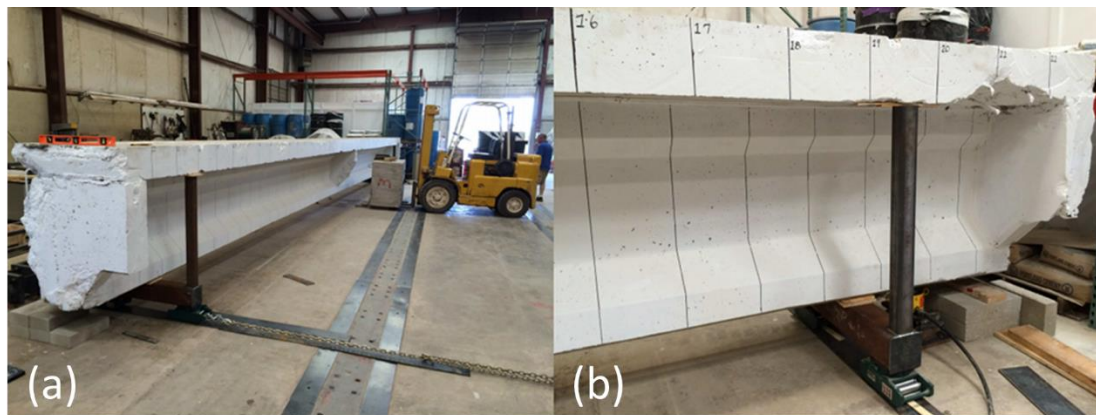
Moving of girder C (a) and the gridlines on girder C (b)
